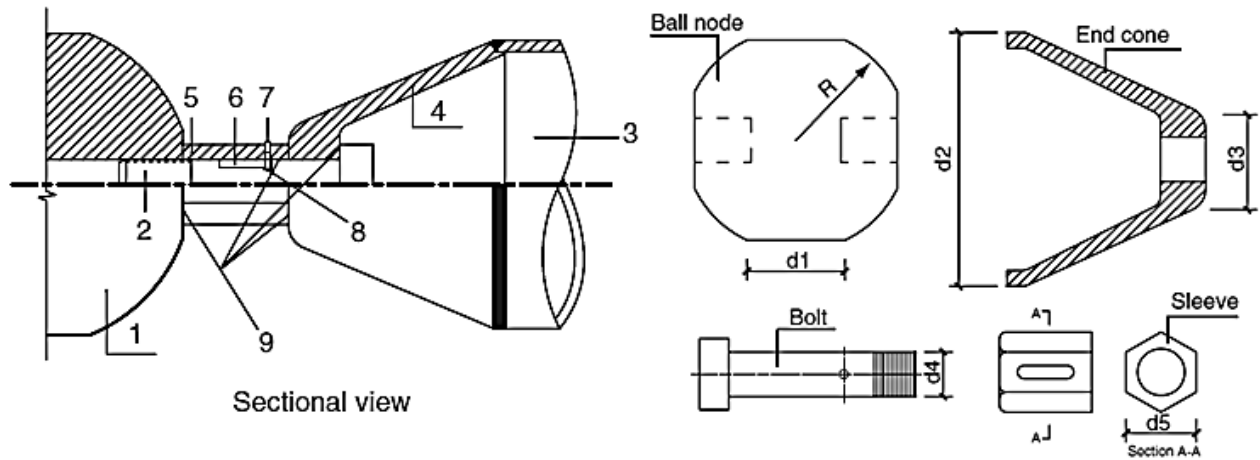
Bolt-Ball Jointing System Component Elements (Fan et al. 2010)
